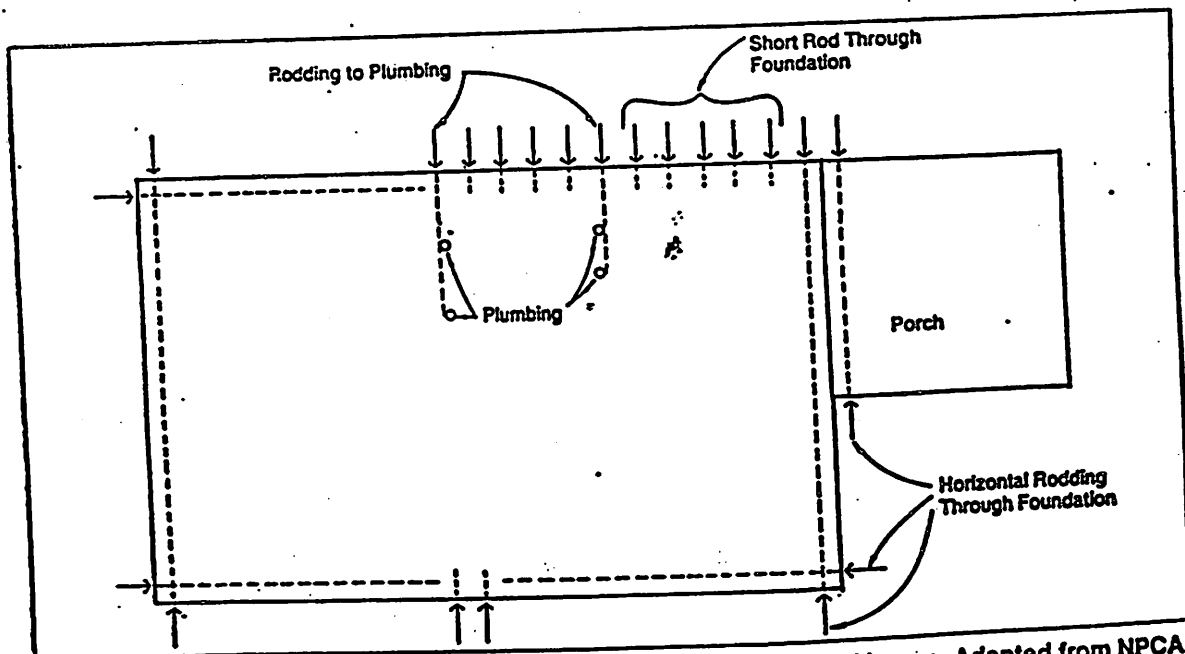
A plan for long- and short-rodding under a slab-on-ground house. Adapted from NPCA.
